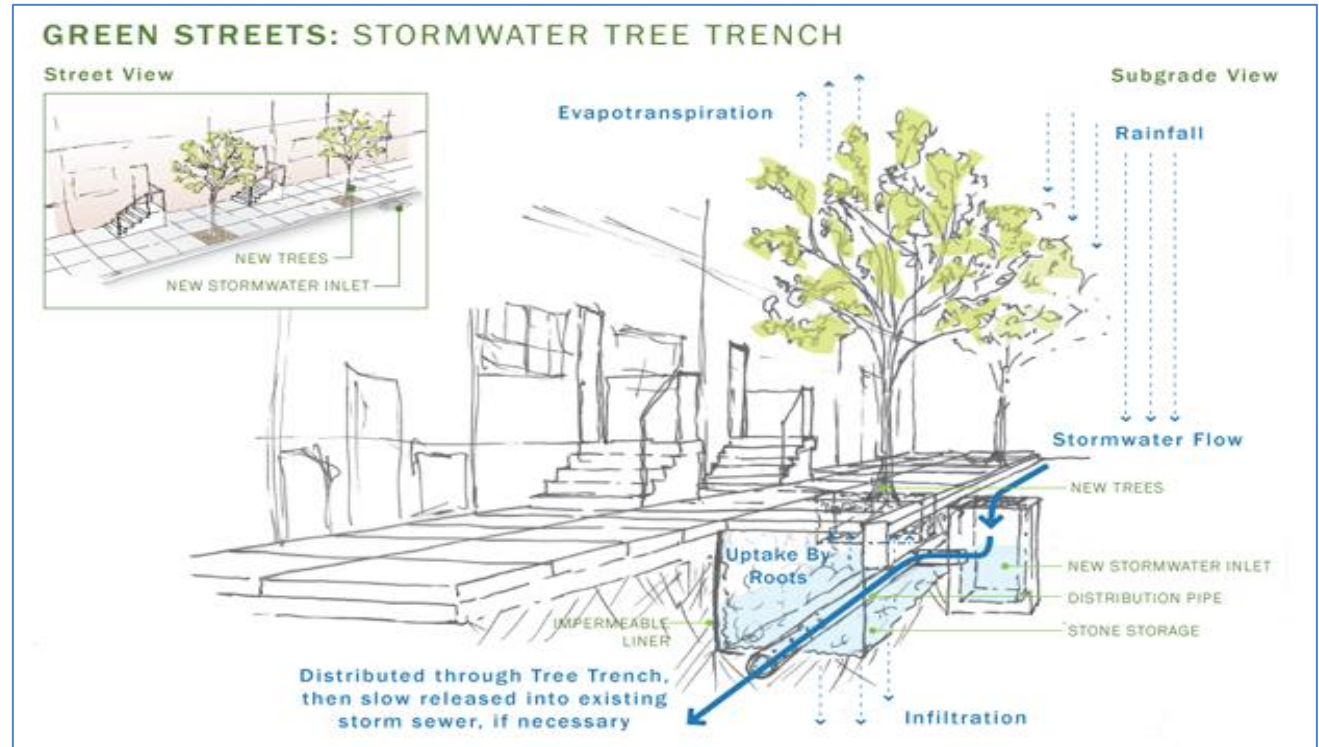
Sketch of "green" trench design for intercepting stormwater.
